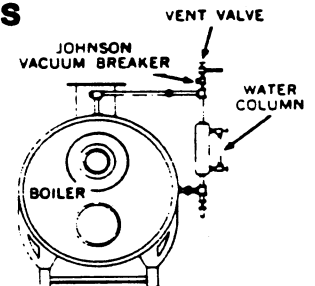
Typical application of a Johnson Vacuum Breaker as used on a steam boiler to break a vacuum imposed when a boiler is shut down, thereby condensing the steam in the boiler and creating a vacuum. This condition causes the boiler to be flooded by pulling in excess water from the return system. The vacuum breaker is normally installed at the top of the water column as illustrated.
